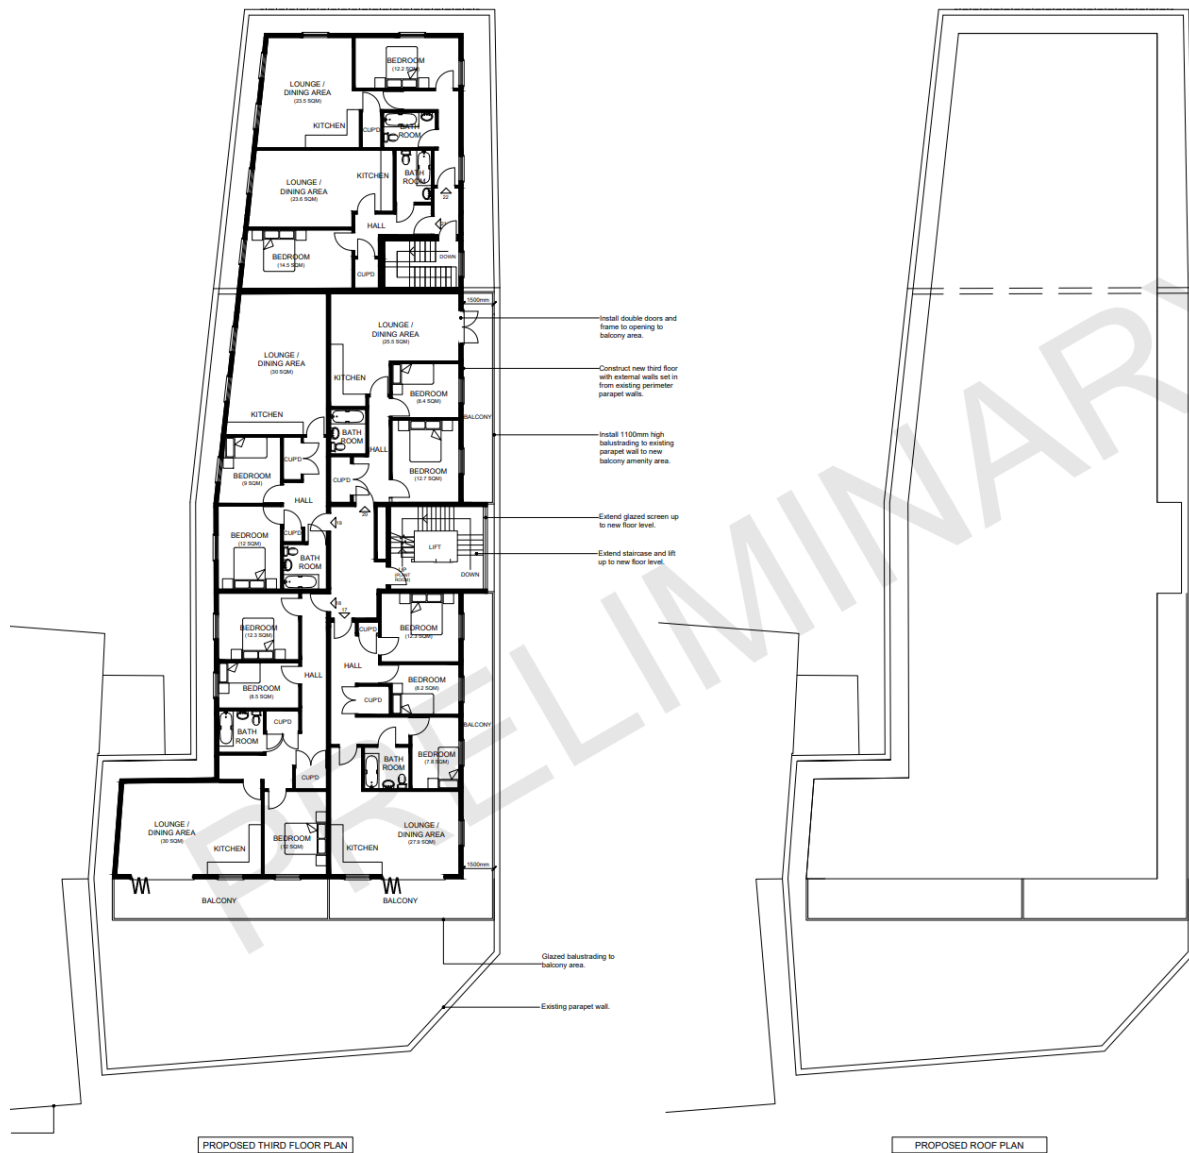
Architectural Drawings of Proposed Third Floor
